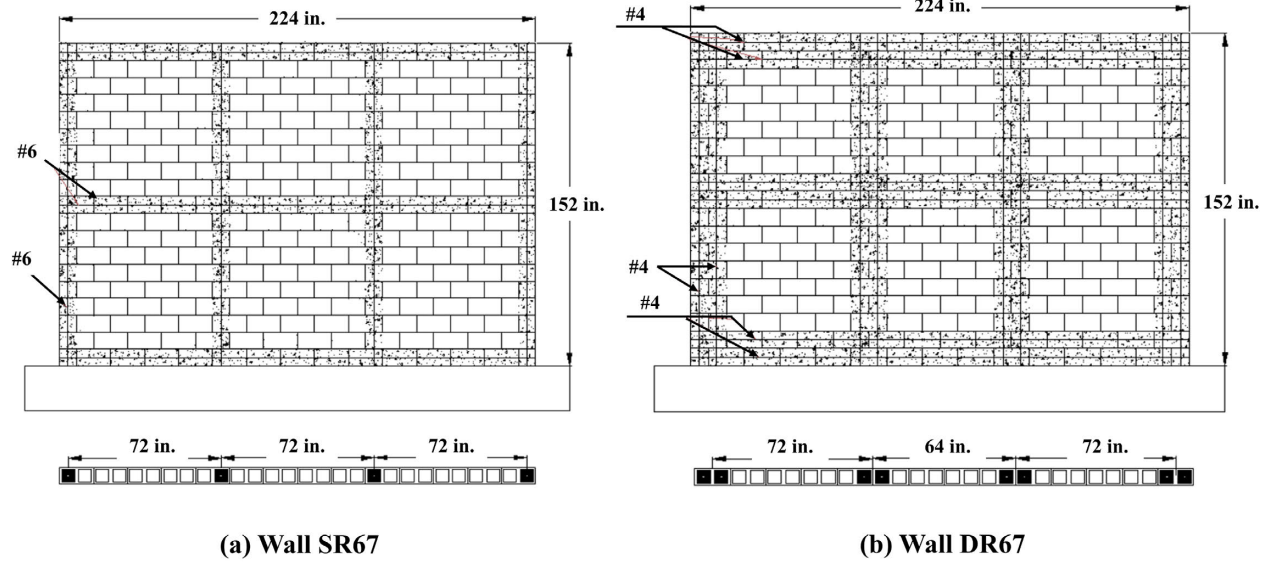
Reinforcement details of SR67 and DR67 (adapted from Bolhassani et al. 2016).
